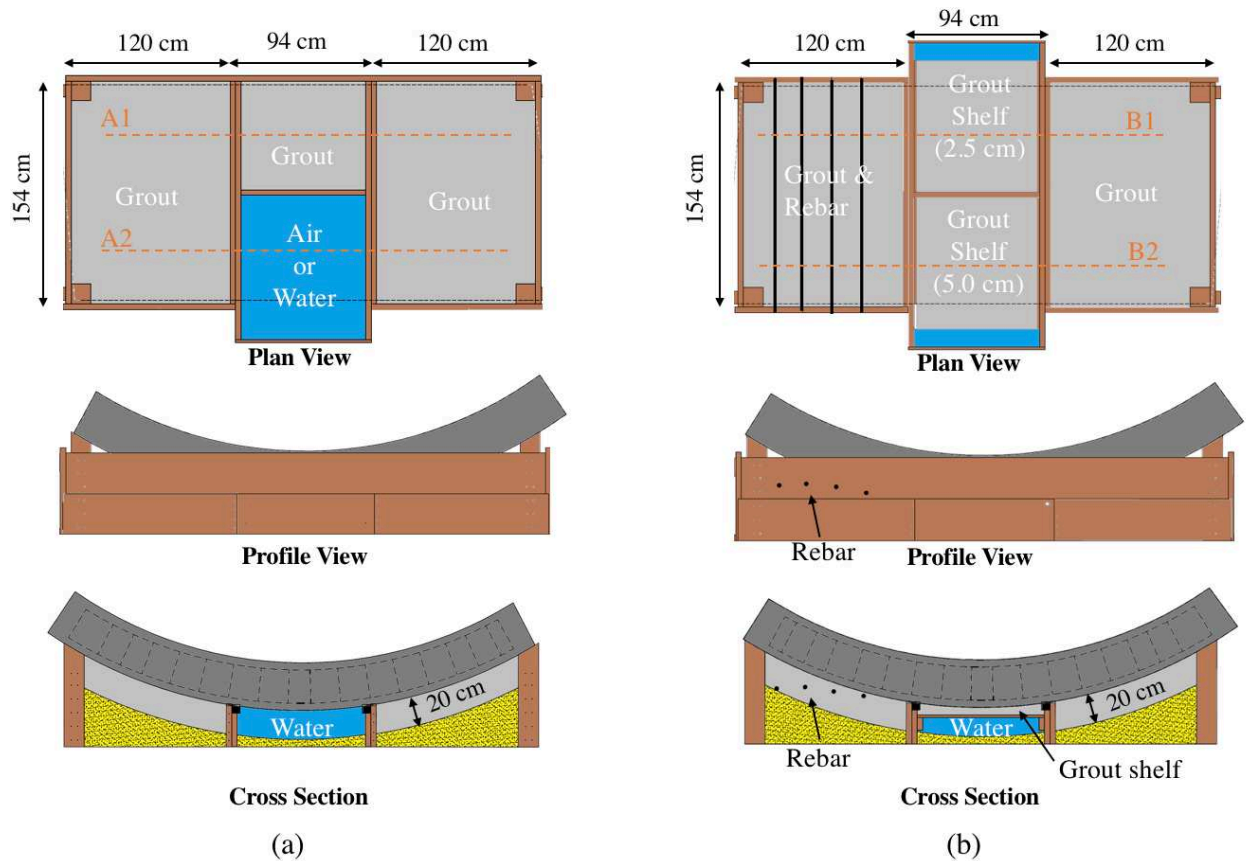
(a) Support frame A plan view, profile view, and cross section (b) Support frame B plan view, profile view, and cross section
